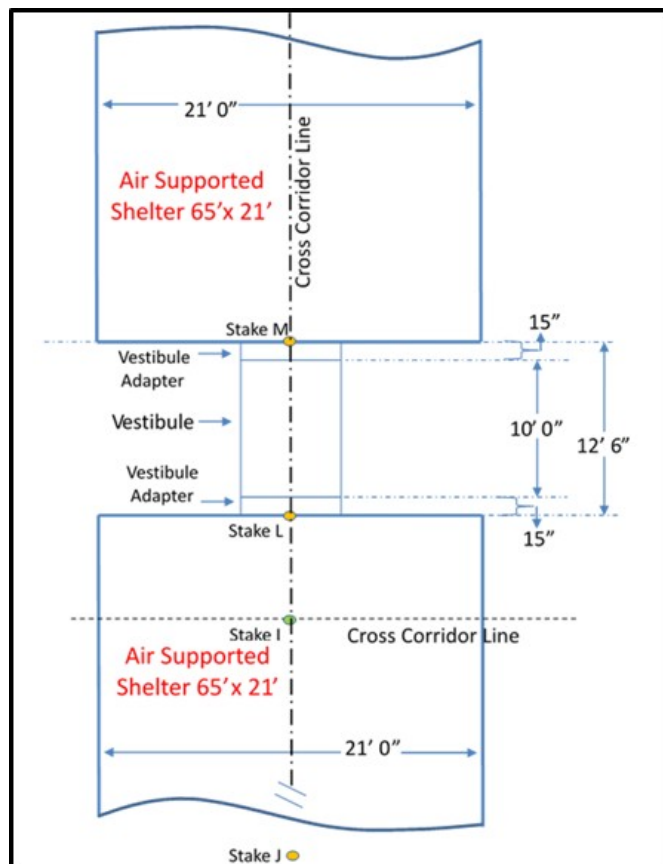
Alaska Shelter 65 ft. by 20 ft. side door panel to Alaska Shelter 65 Ft. by 20 ft. side door panel
